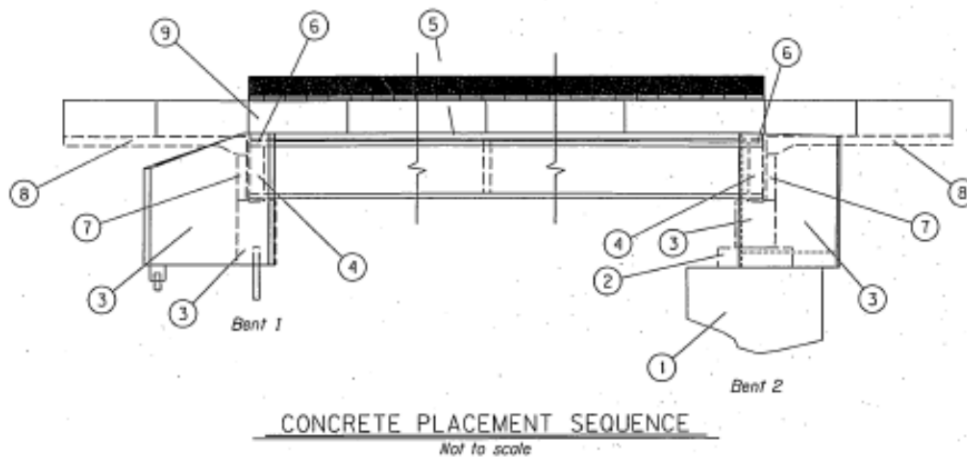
Diagram. Concrete placement sequence for bridge 21252.
